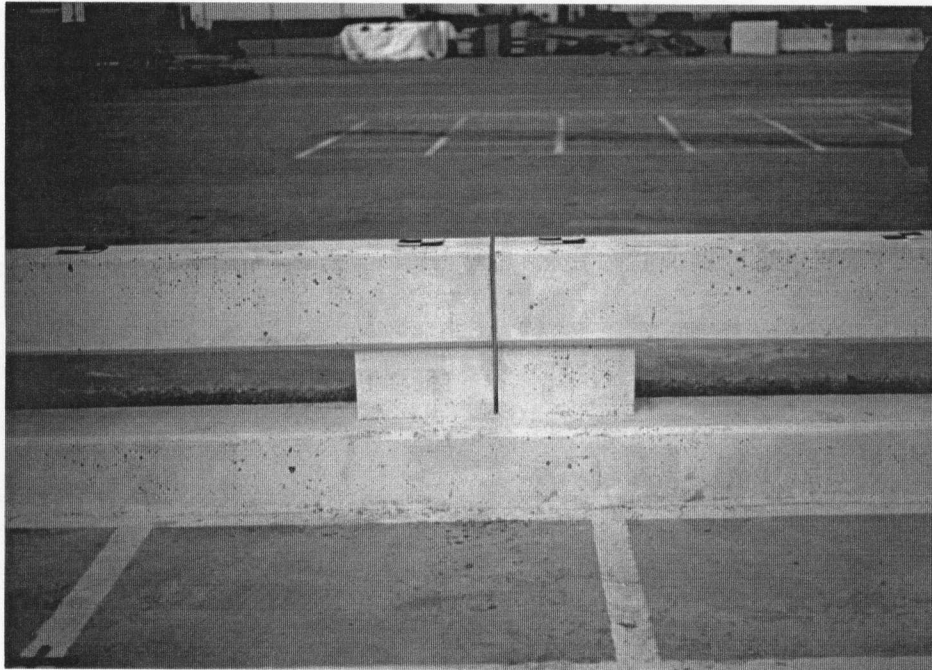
Photographs of Wingwall Section Parkway Bridge Rail
